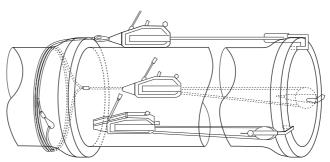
Jointing equipment (Pont-a-Mousson, 1992).
